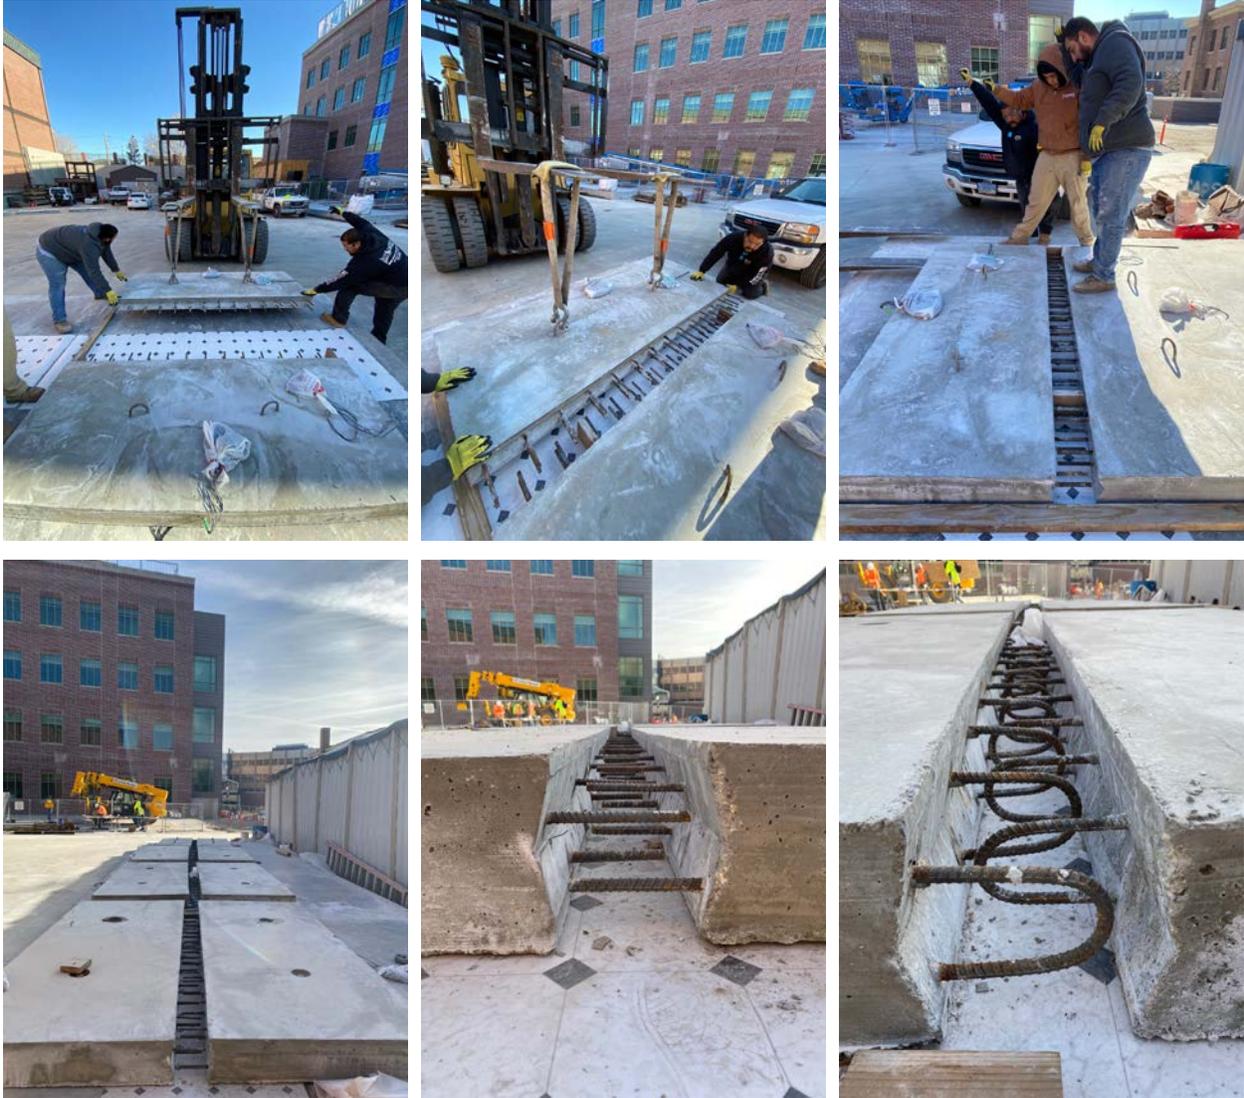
Formwork and reinforcement for construction of deck panels and specimens
